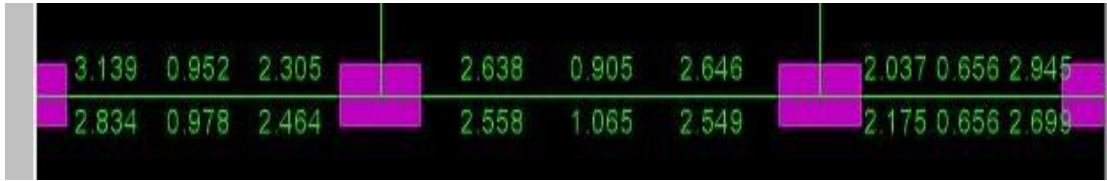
Reinforcement Area of 1<sup>ST</sup> FLOOR (Y-Axis)
